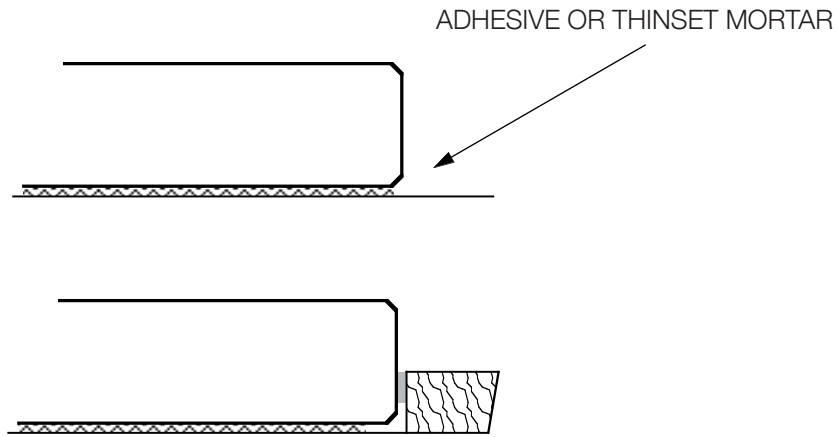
A - Slab or Sitting Hearths set above or into typical flooring
